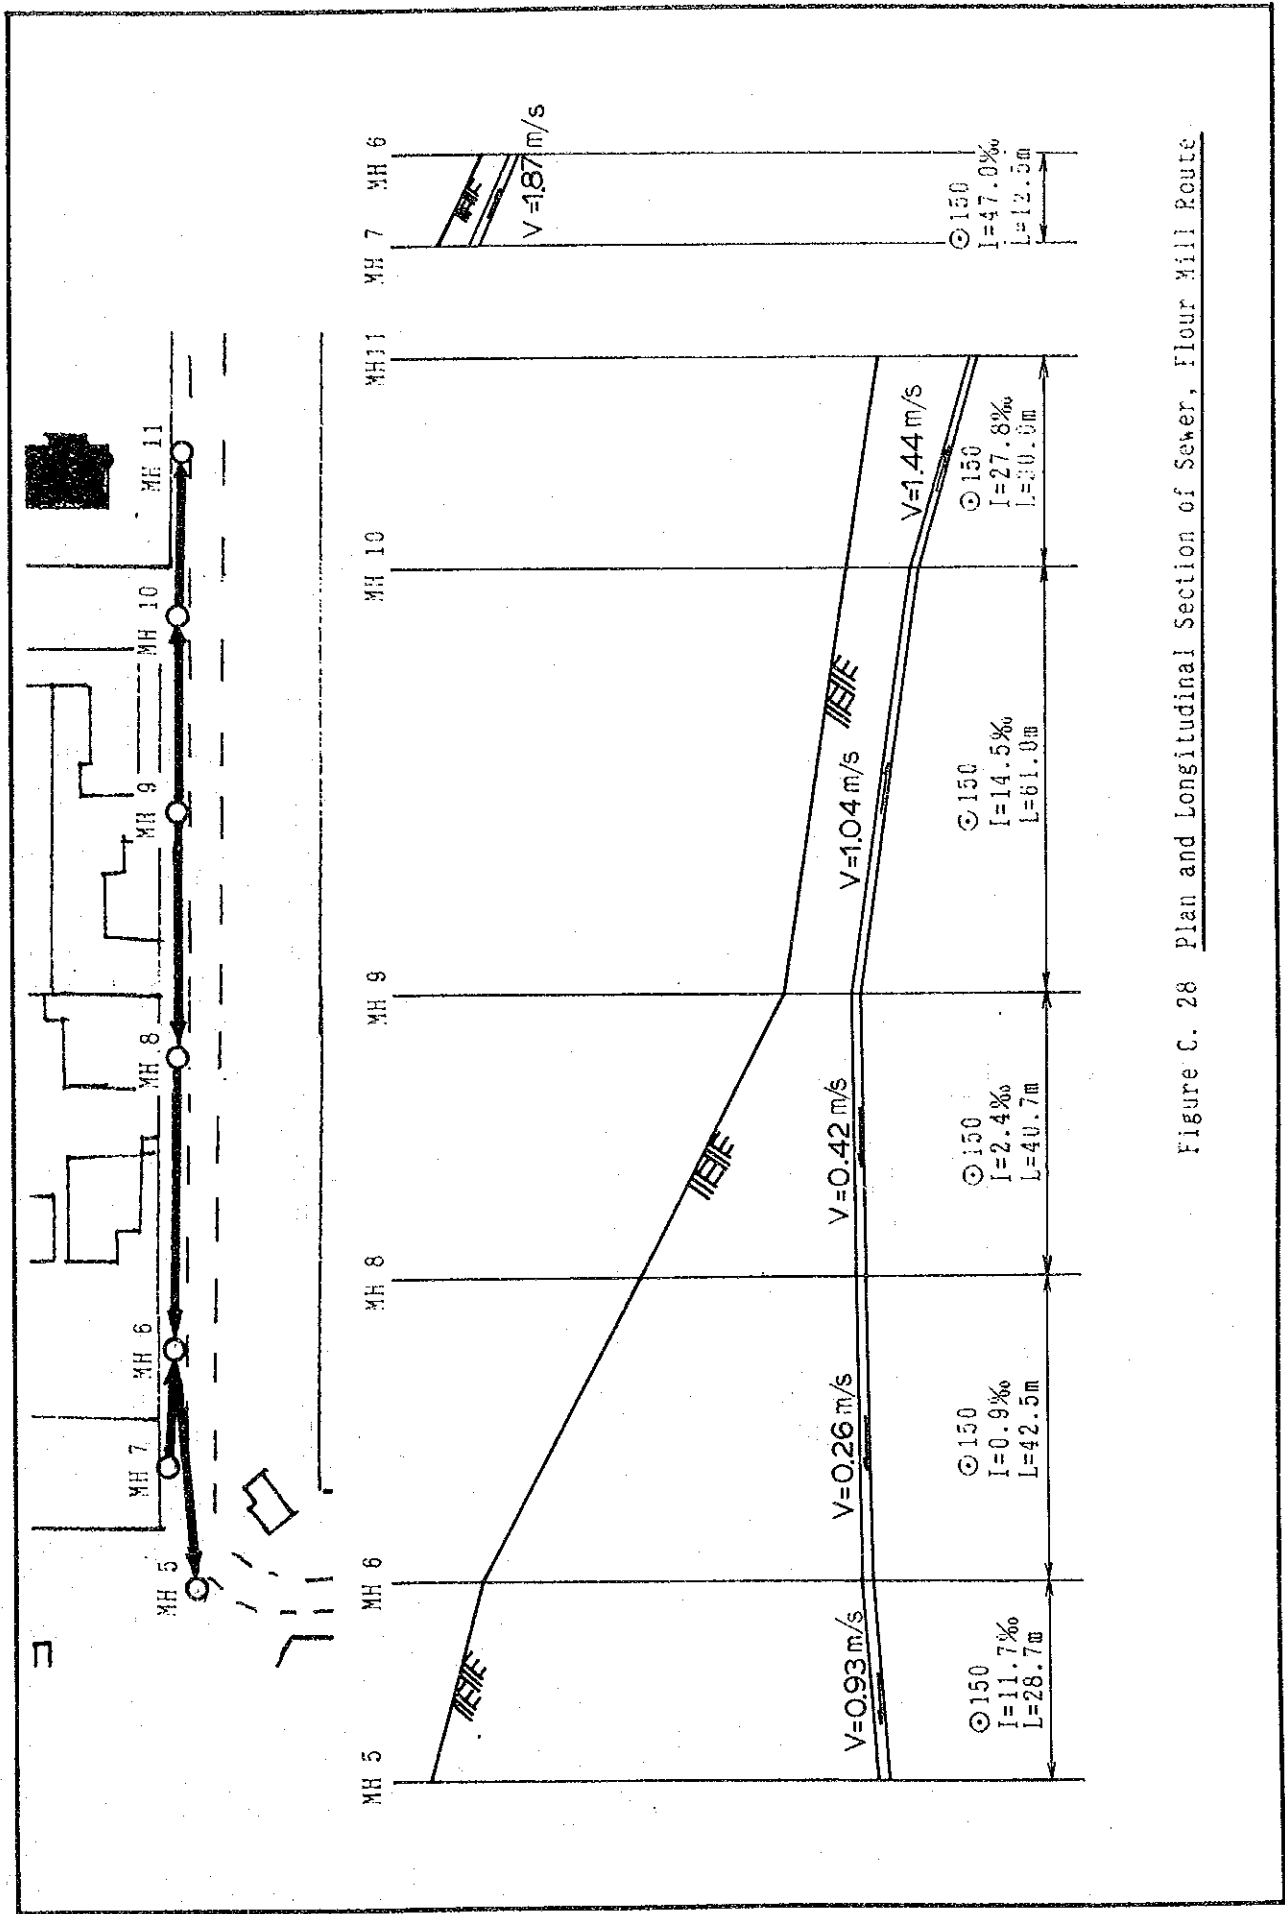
Plan and Longitudinal Section of Sewer, Flour Mill Route
